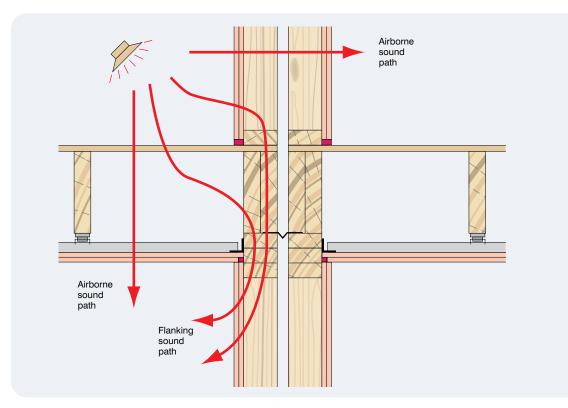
Flanking and airborne noise pathways - elevation view.
